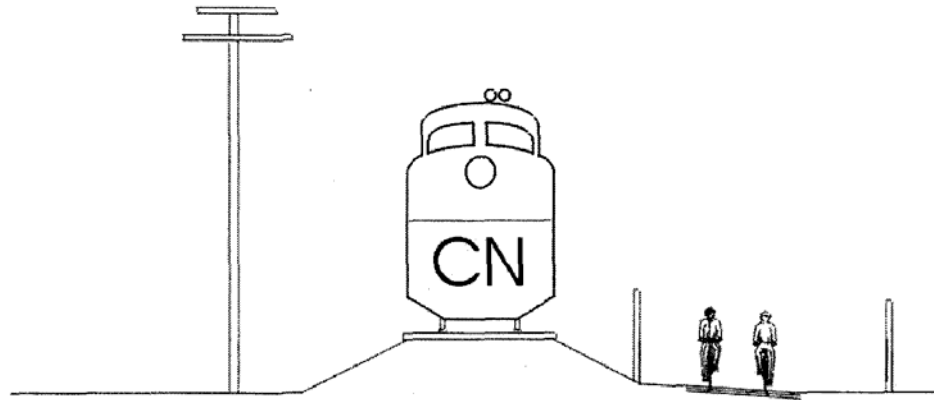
Typical cross-section of a cycling facility adjacent to a rail corridor separated by a fence.
